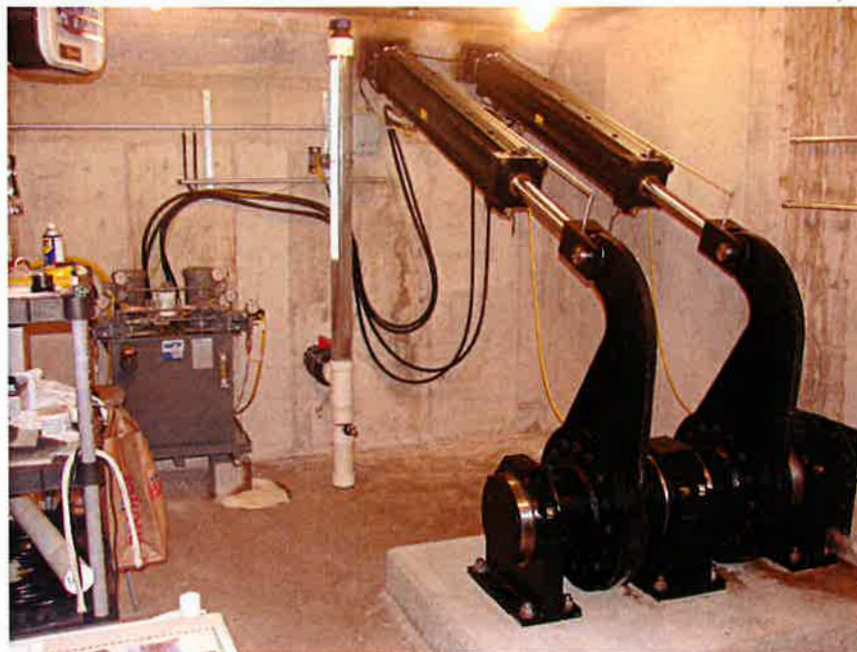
View from under DS right (south) side of spillway slab, 2012 photo. No seepage.
